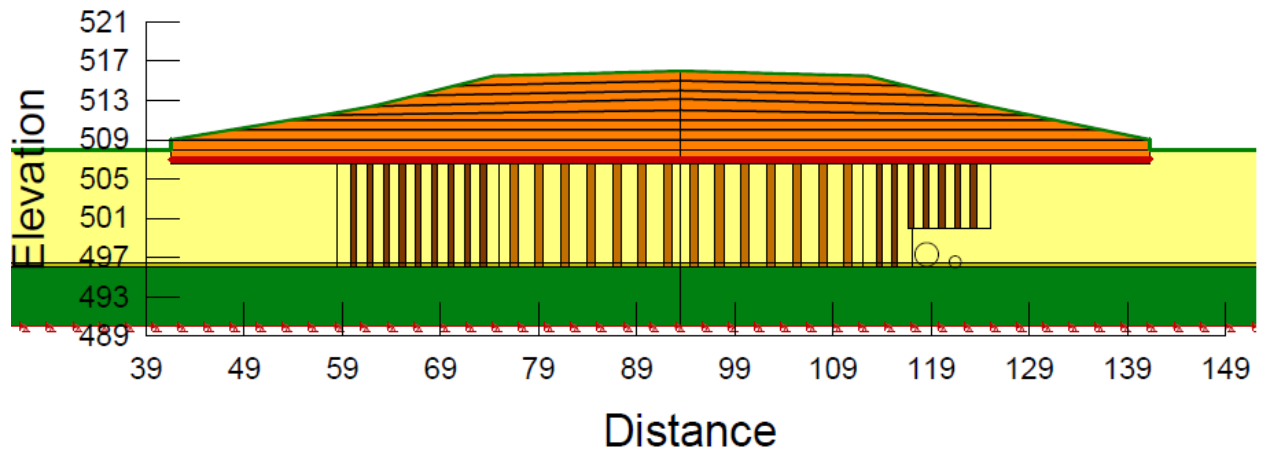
FEM North Abutment Cross-Section Model Completed Stage
